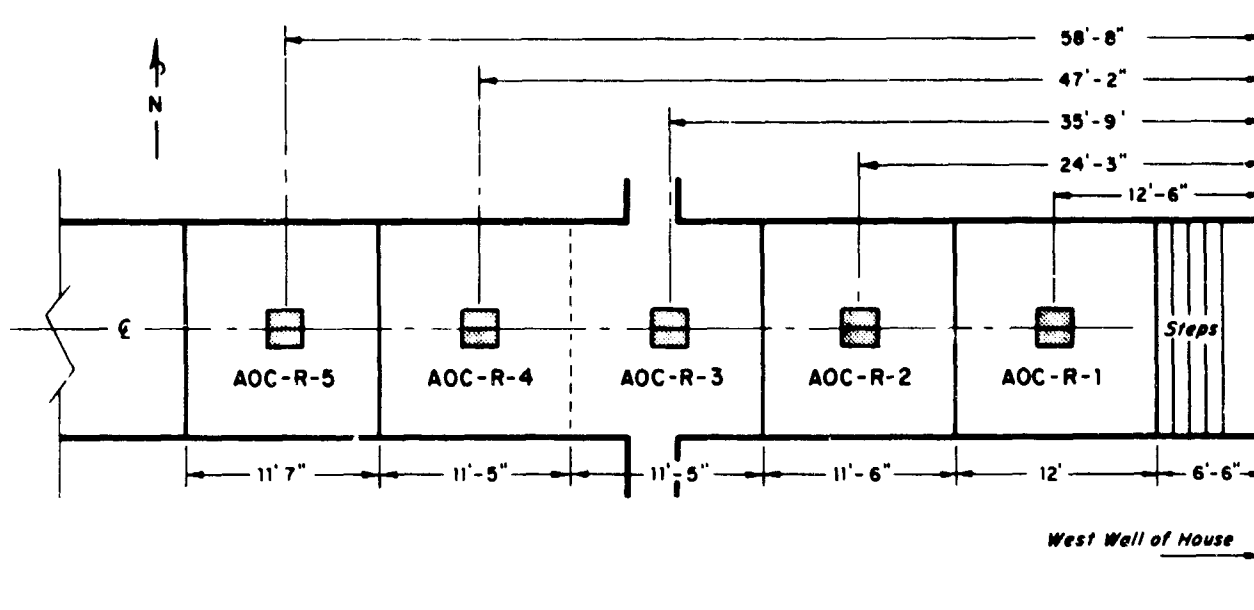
Test Romeo Station Locations Back Walkway - Concrete Surface
